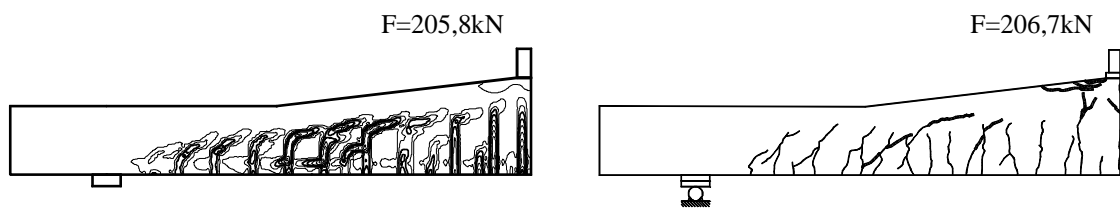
Crack propagation at failure of test beam 4L1 from Non-FEM and test
